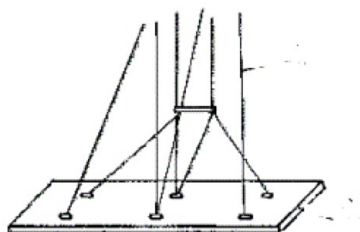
Floor slab slinging (TFC 6307030131/41131 1991)
